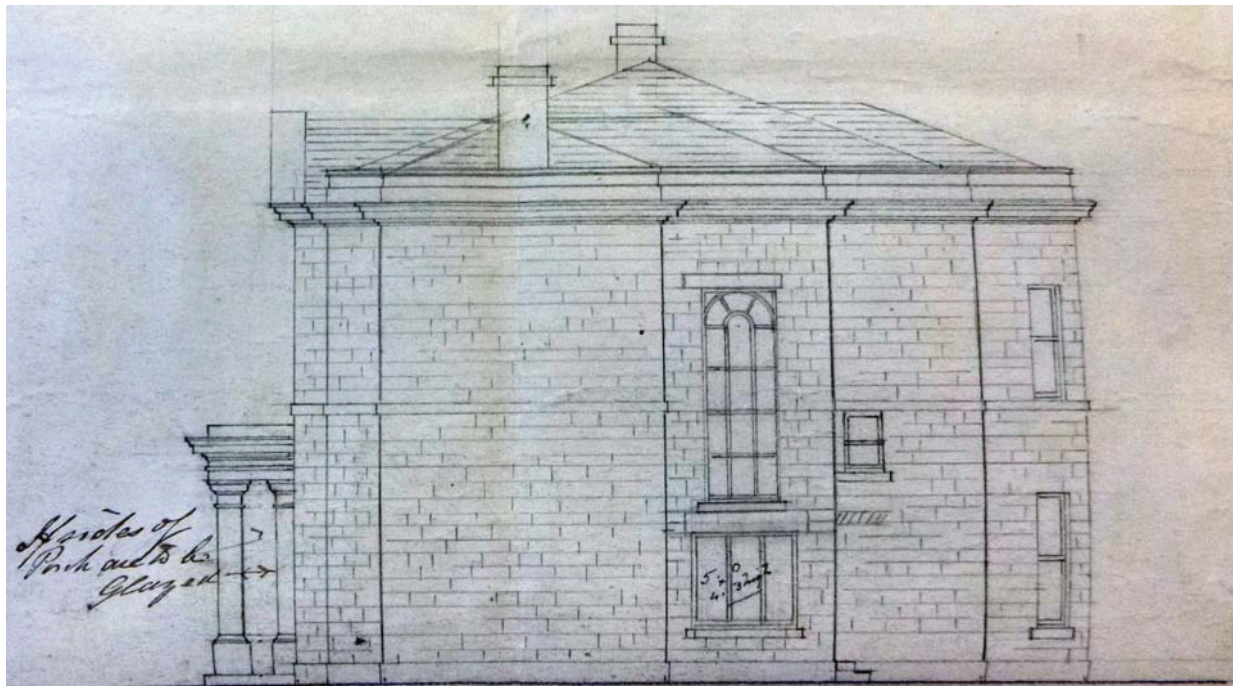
The west elevation of Fair View showing proposed changes, 1889
